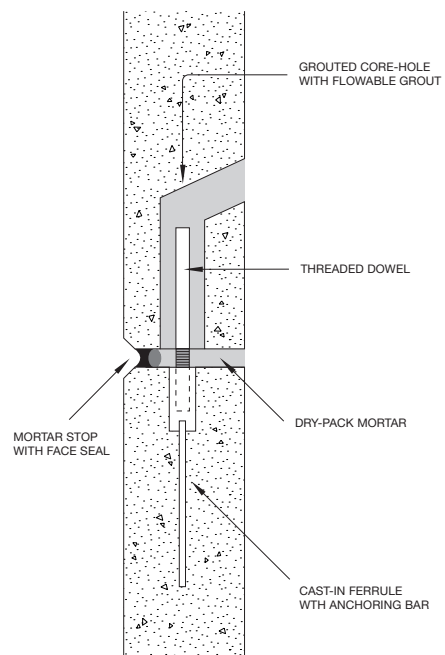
Section View – Panel to Panel Top Lateral Restraint Connection. (Cast-in ferrule and threaded dowel, grouted into top panel)
